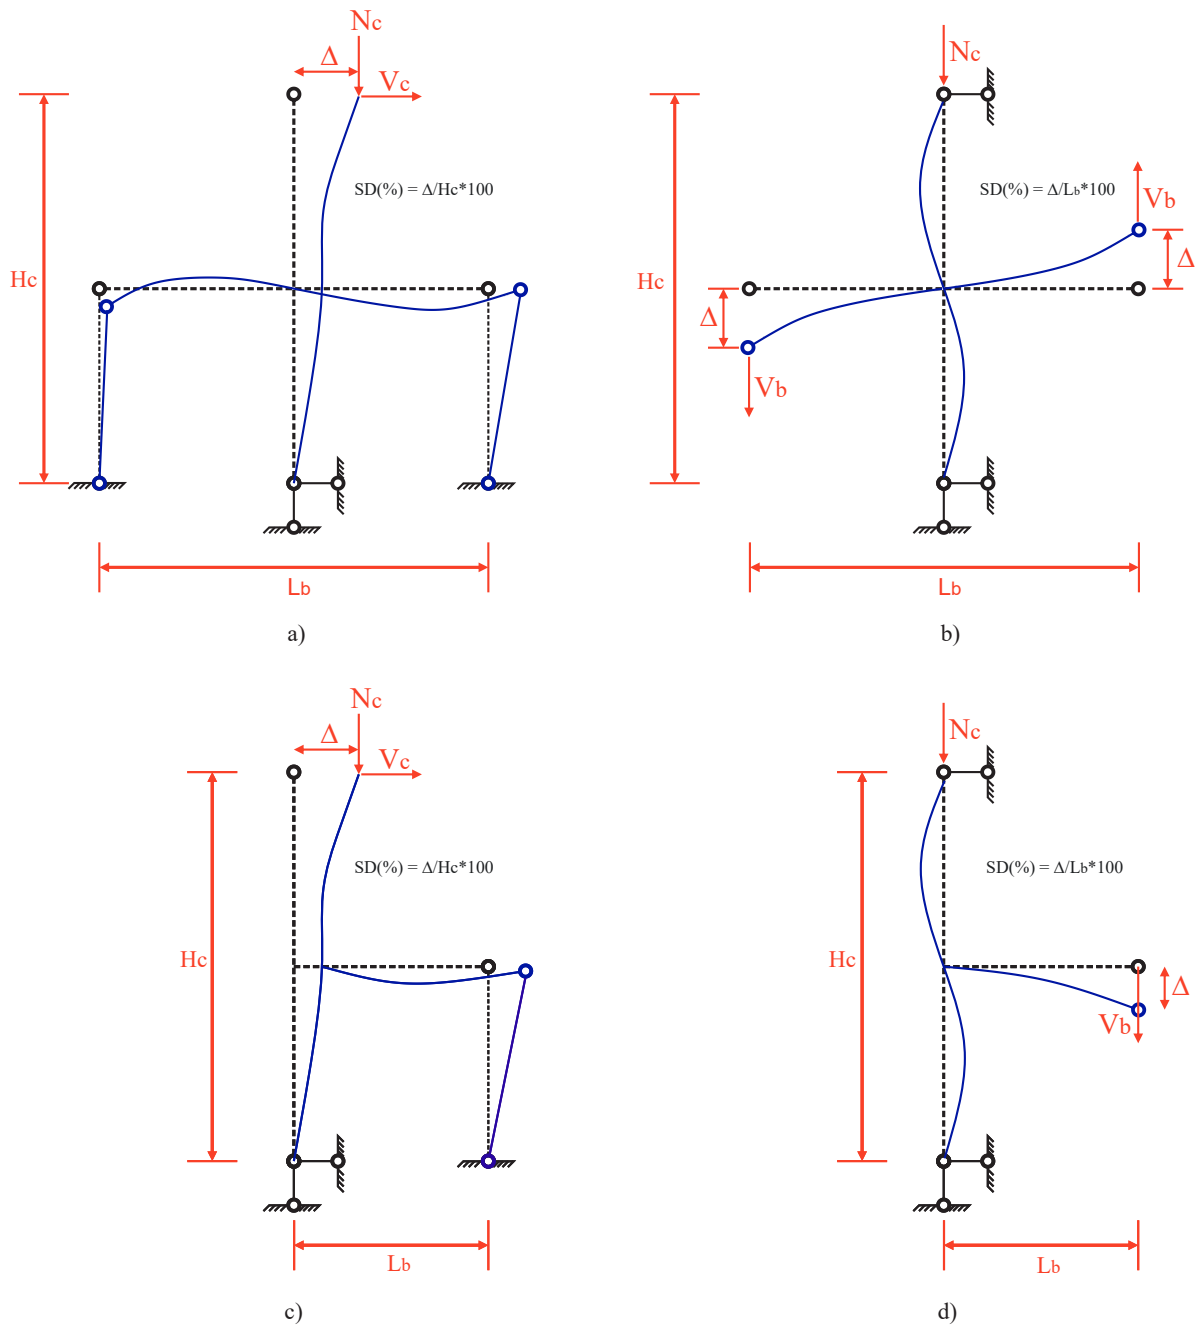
Beam-column joint deformed configuration: Interior with cyclic load a) In the column, b) In the beam; Exterior subjected with cyclic load c) In the column, and d) In the beam.
